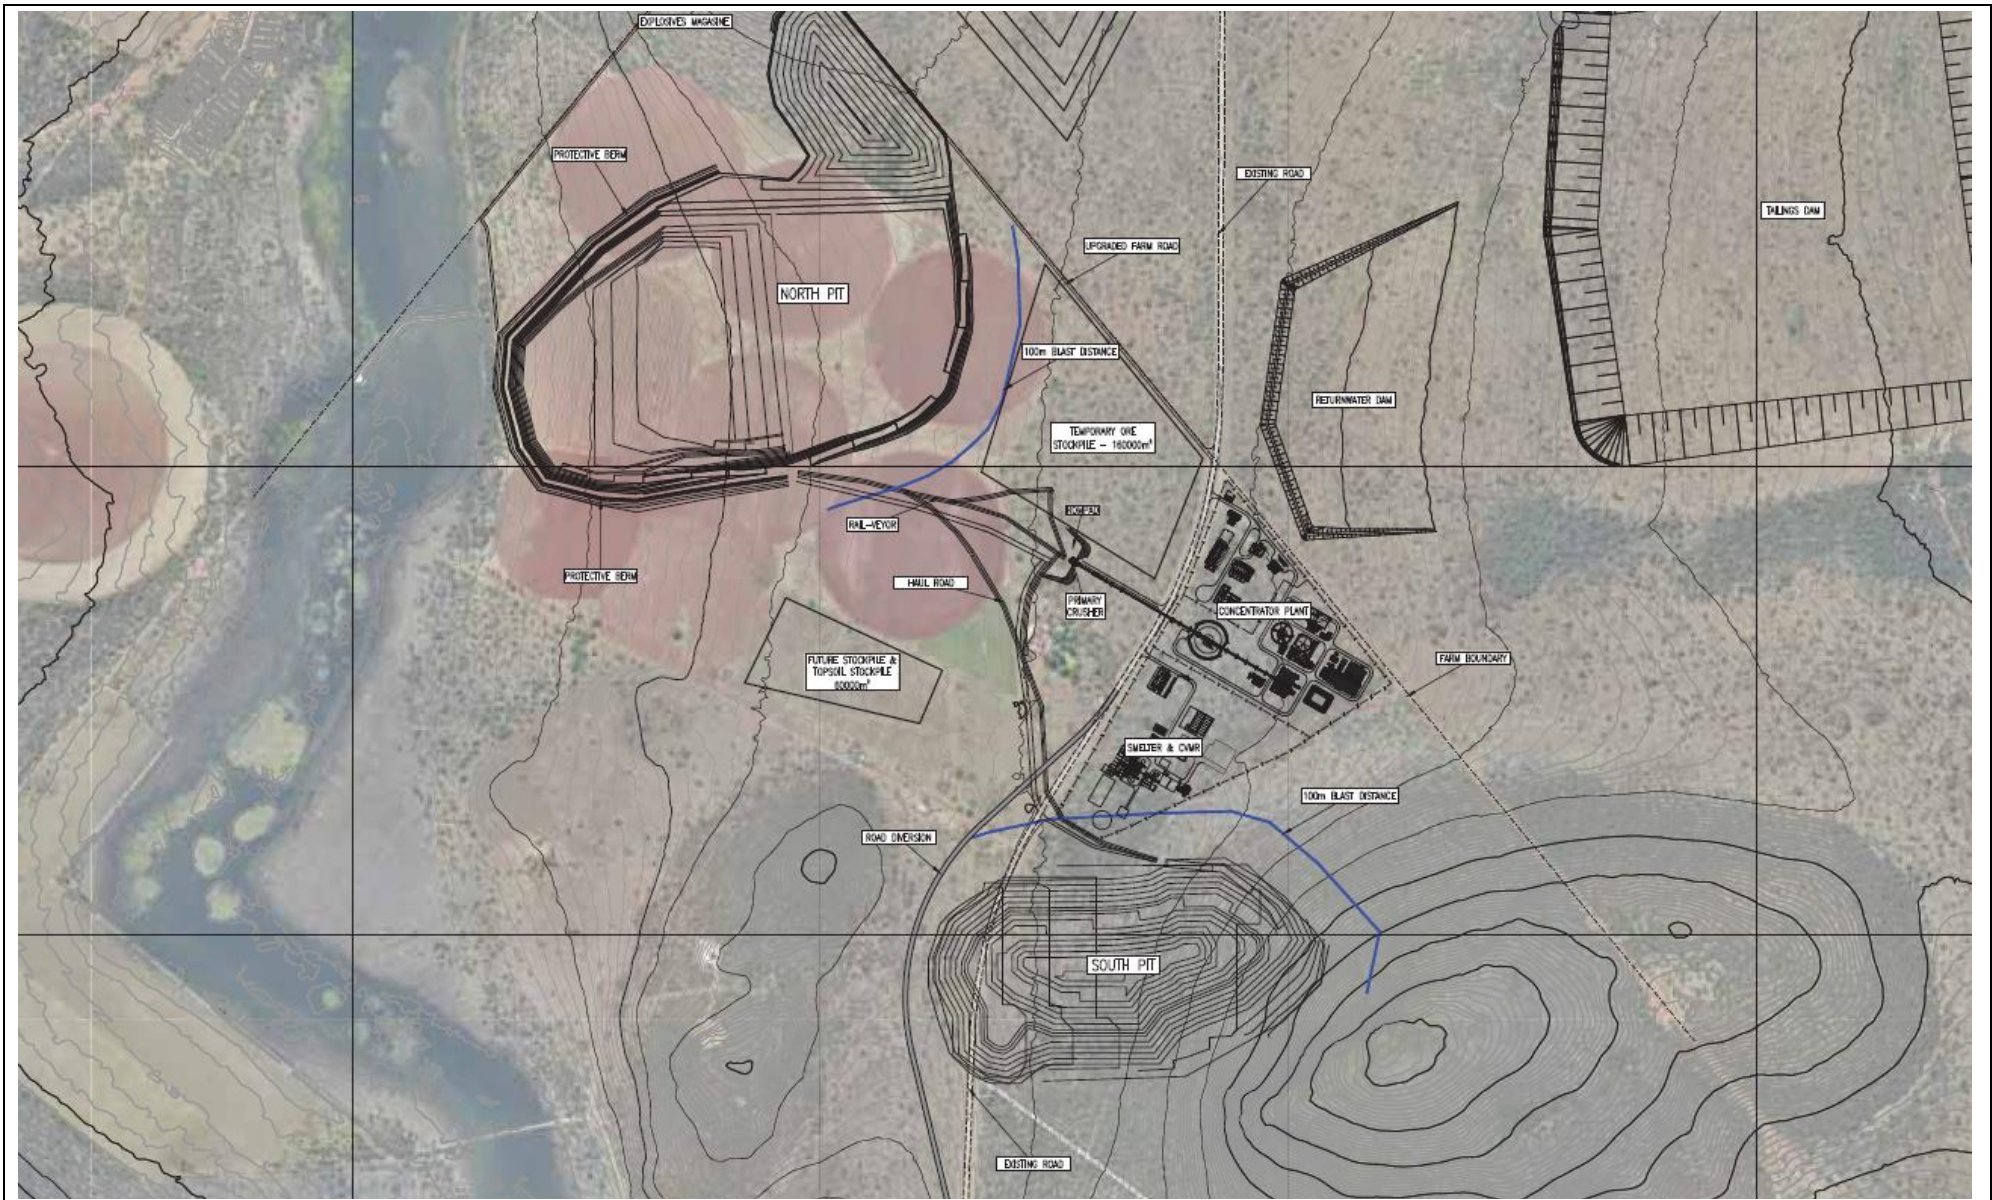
Site Plan for the Proposed Volspruit Mine (For an enlarged version kindly refer to Appendix 3)
